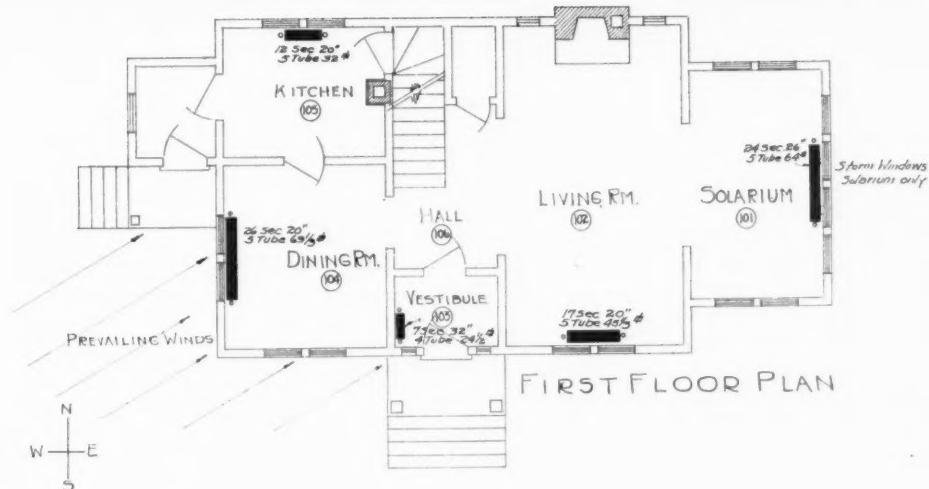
First floor plan showing rooms and radiators, location and size, prevailing winds and exposures.
